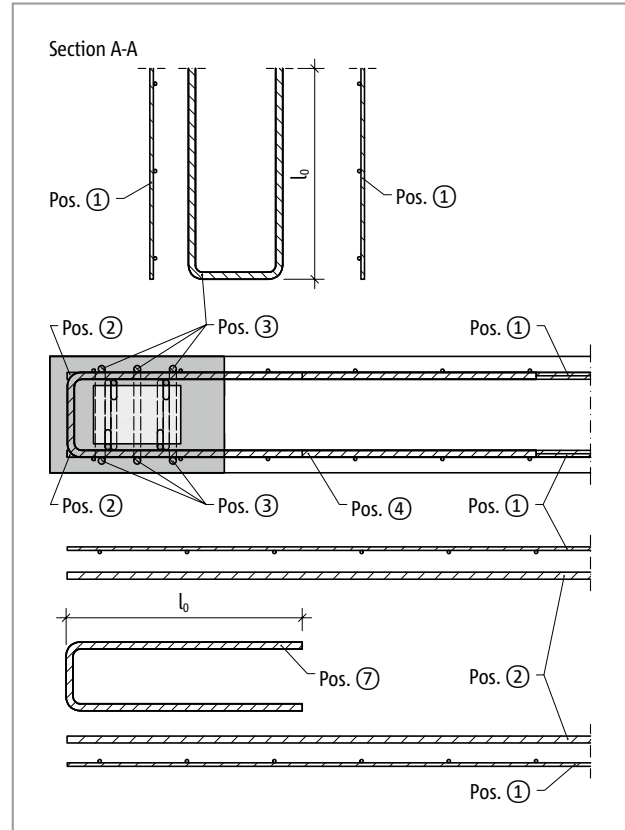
Schöck Scconnex® type W-N-VH: Variant A – on-site reinforcement with Pos. 4 for connection to end of wall
